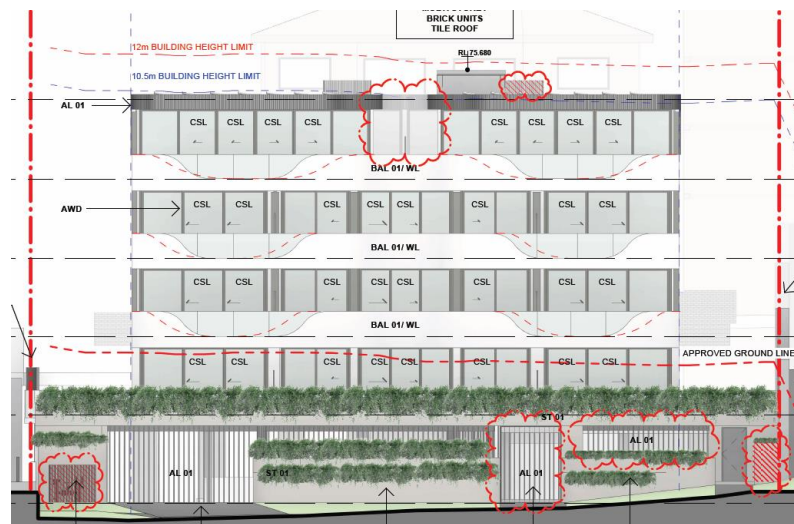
Approved modified eastern elevation under DA/526/2022/A – 3-4 Llanfoyst Street, Randwick (Source: Orosi)
